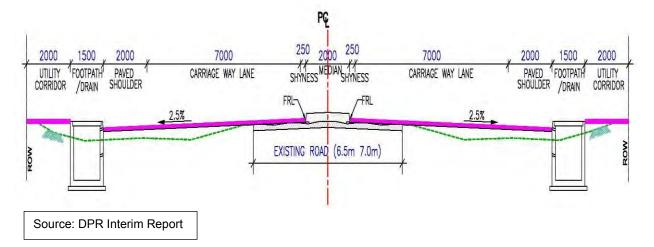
Typical Four Lane Road Cross Section in Rural Area
